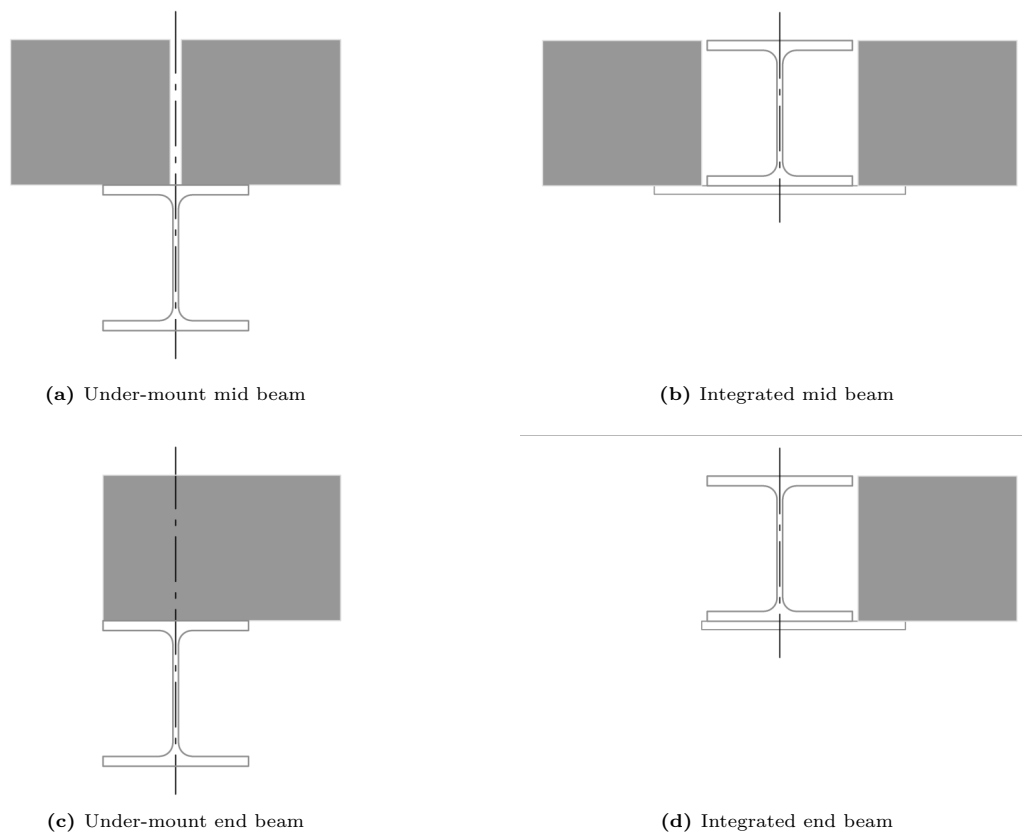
Steel beam types for prefabricated concrete floor systems in mid and end beam configuration
